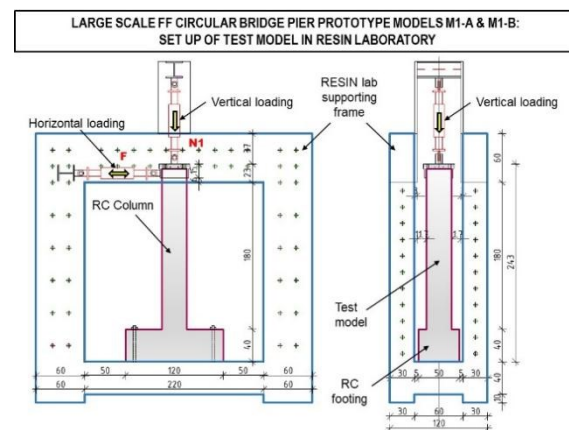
Set-up of flexural failure circular RC bridge pier models M1-A and M1-B in the RESIN laboratory testing frame.
